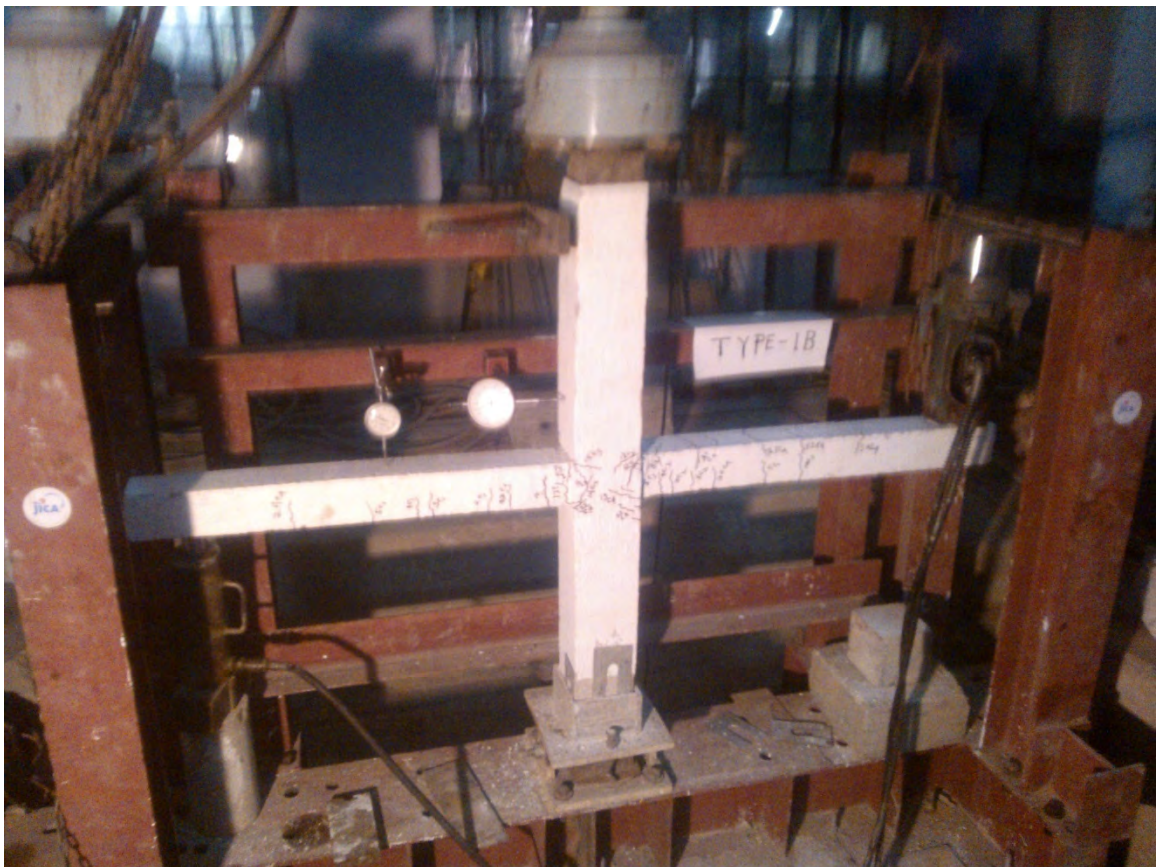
Final Crack Pattern of Type 1B Specimen
